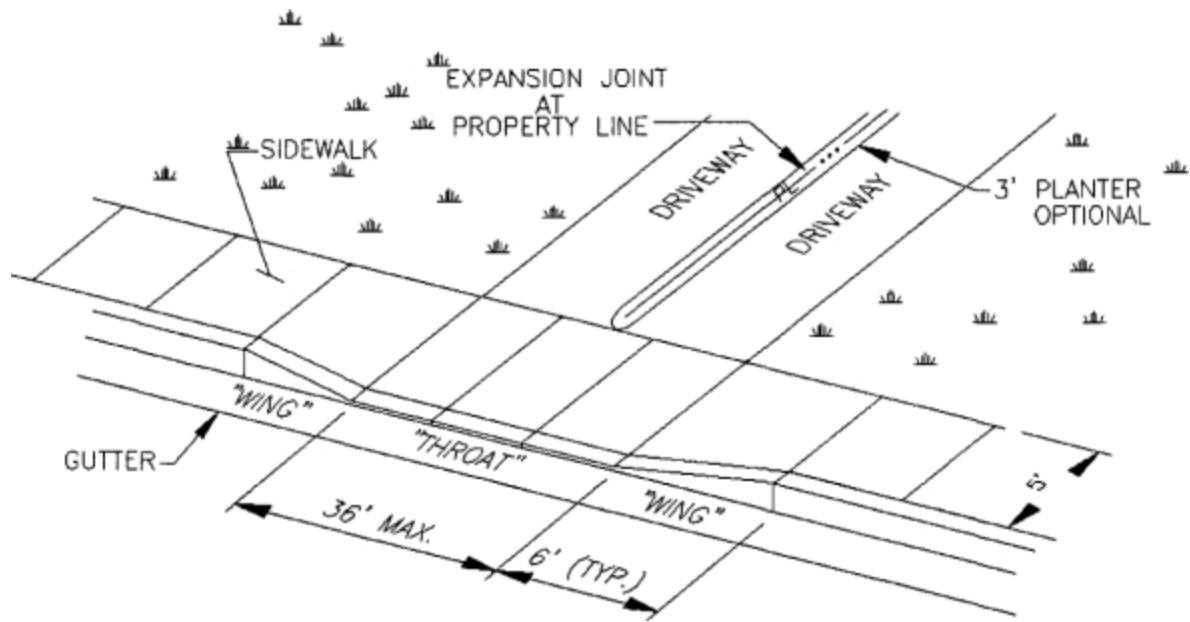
Narrow Lot Shared Driveway Detail with Attached Sidewalk
